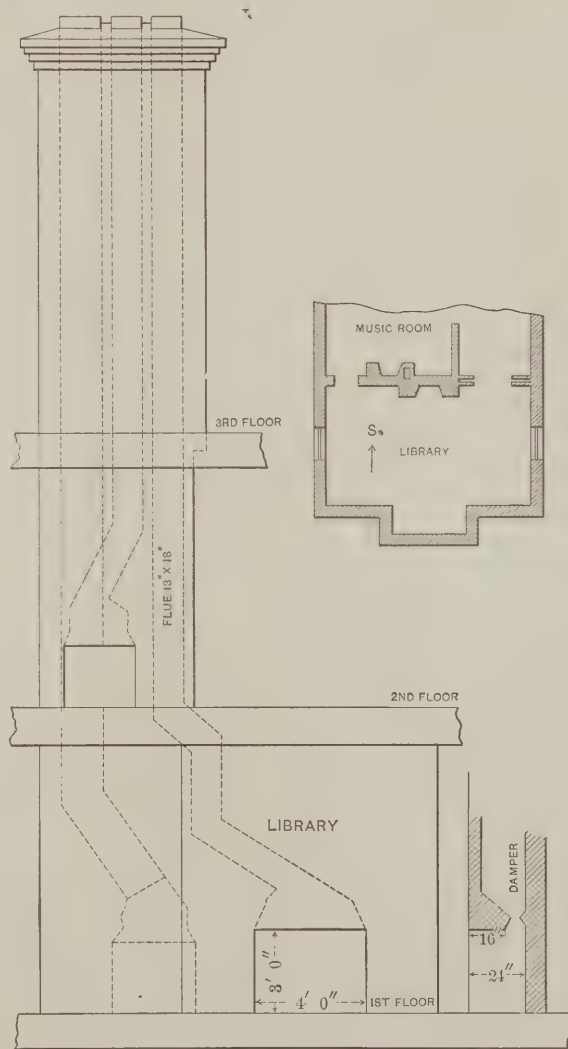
Elevations Showing Construction of Flue and Fireplace; also Partial Plan Indicating Position of Chimney.
